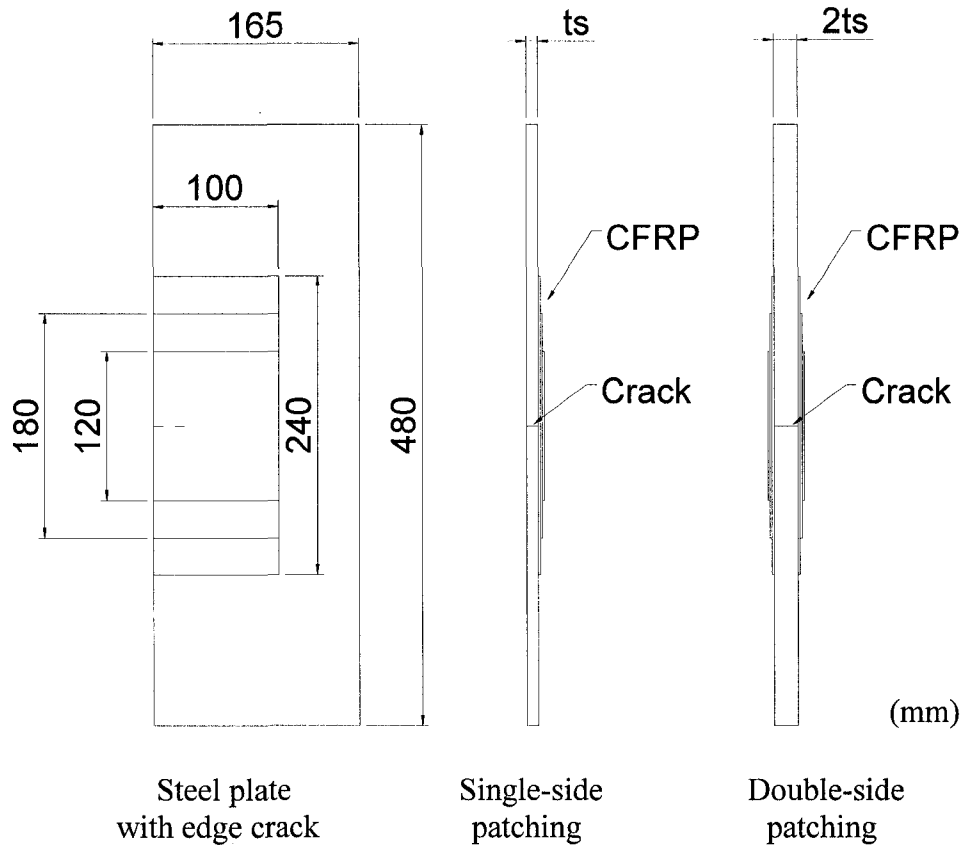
Steel plate with edge crack, single-side / double-side CFRP patching
